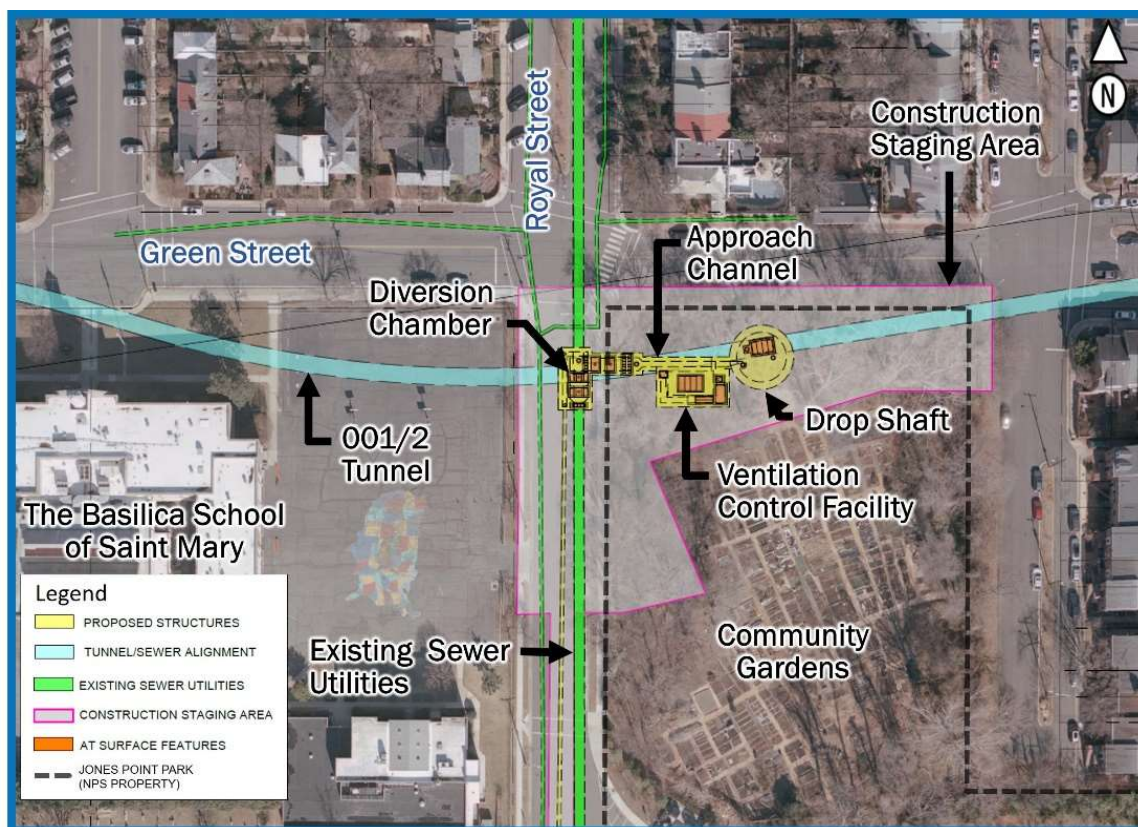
Green Street Diversion Facility (pairs with Green Street Alignment)
